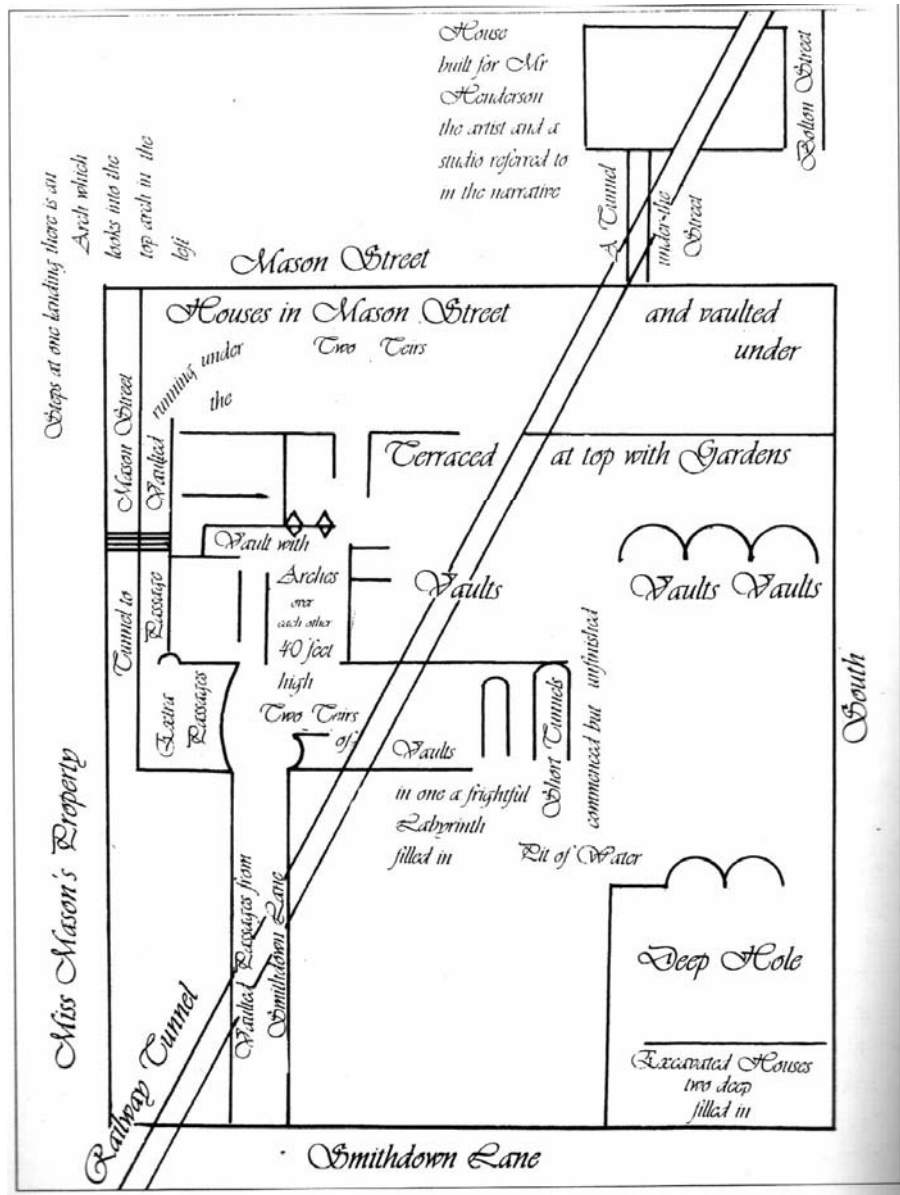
Illustration by James Stonehouse (1863) indicating the presence of vaults and tunnels beneath the houses on Mason Street and Smithdown Lane
